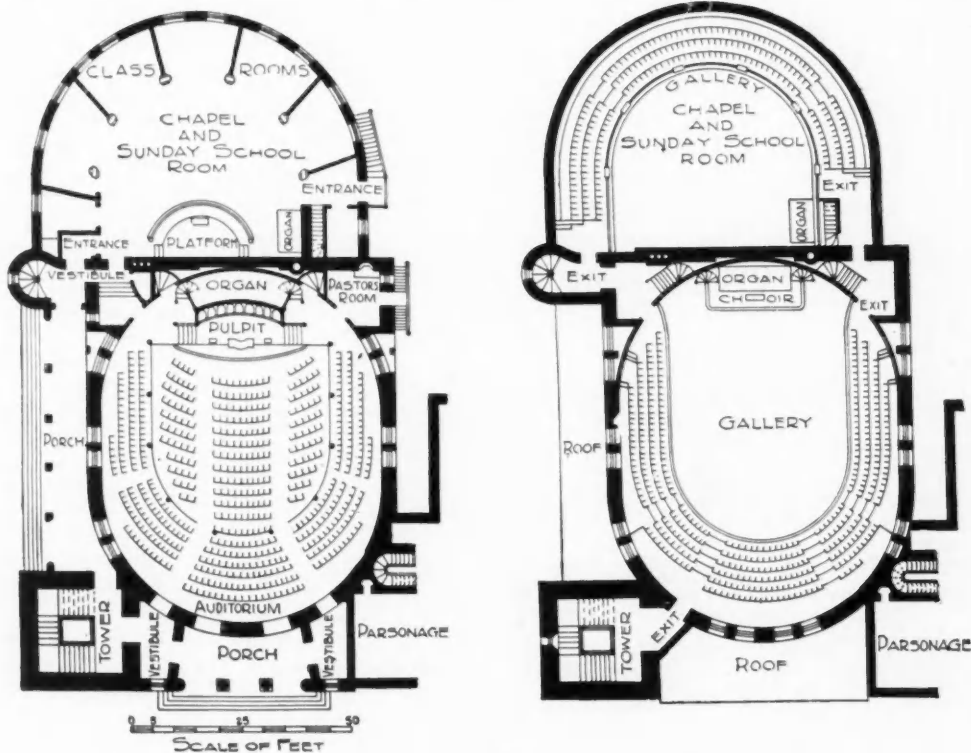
FIRST M. E. CHURCH, BALTIMORE, MD. OVAL AUDIENCE HALL PLAN.
